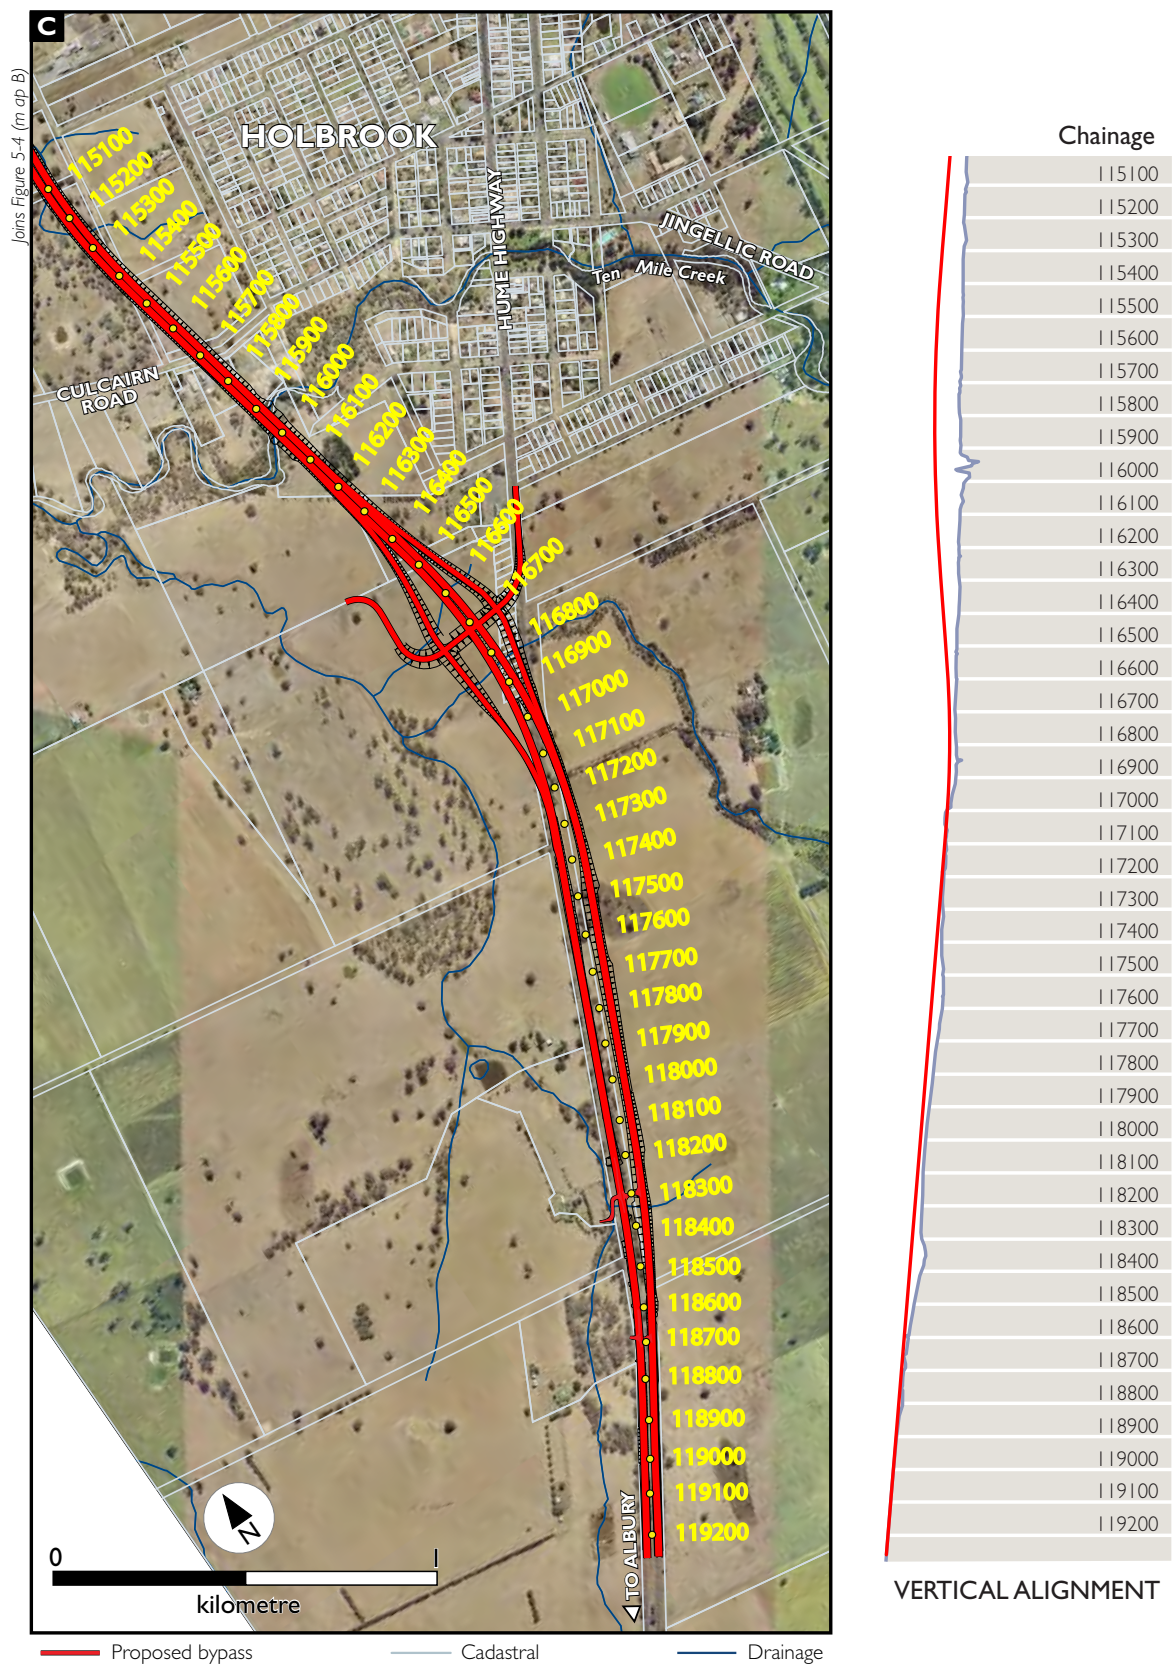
Proposed bypass design horizontal and vertical alignments (southern section)
